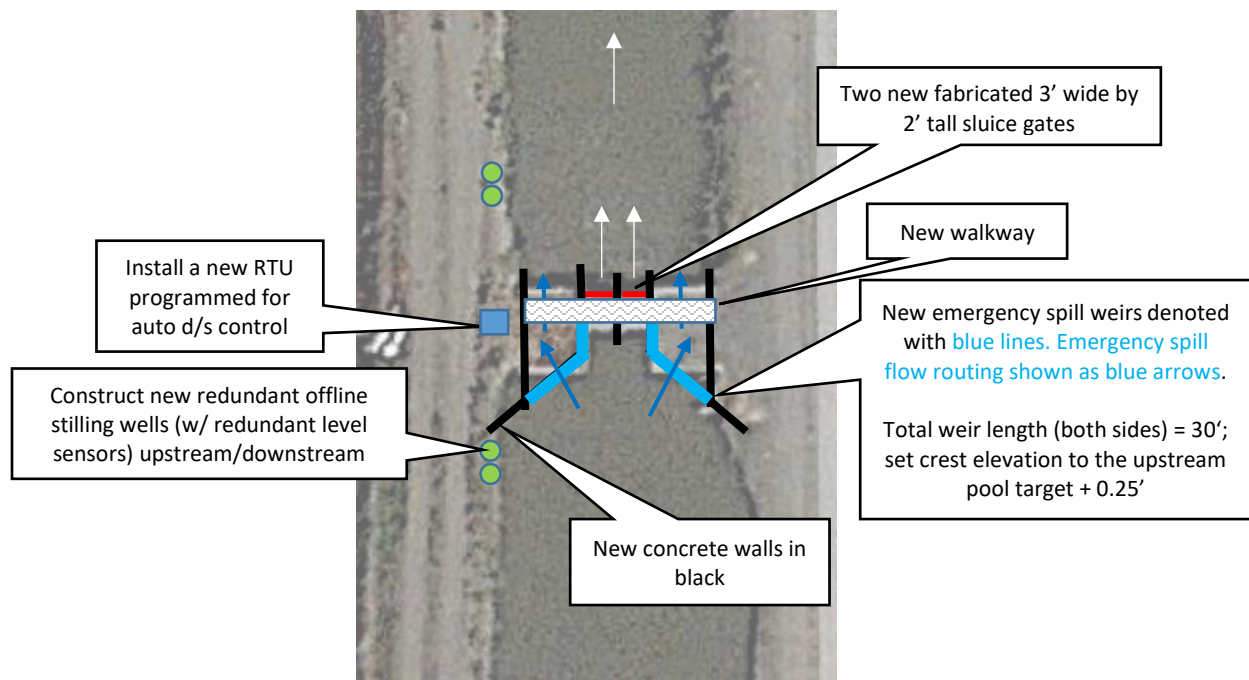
Conceptual drawing showing the new automatic downstream control structure at Branch 4 Canal Station 180+00, plan view
